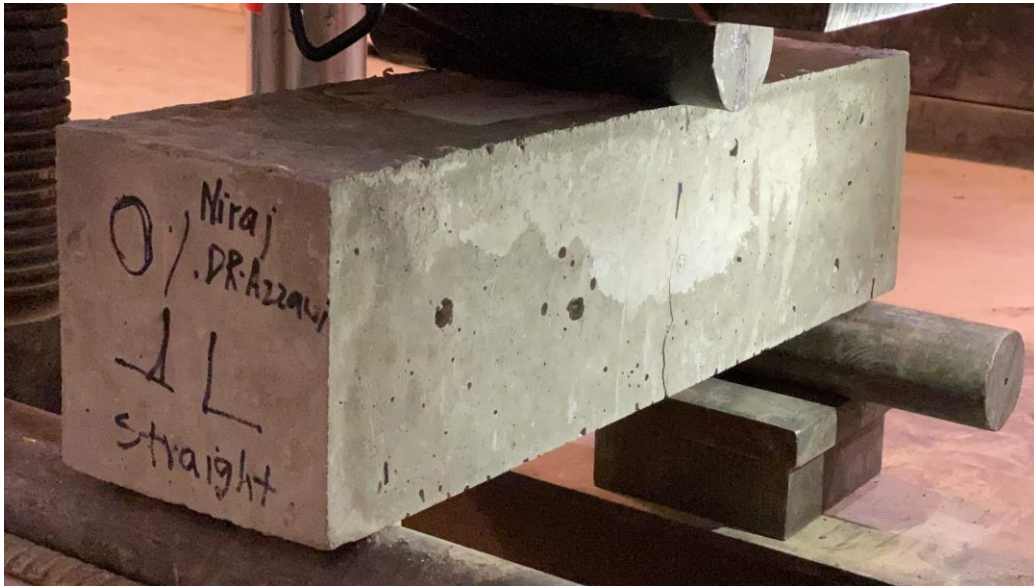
Beam failure and Cracks at Peak Load for 0%
